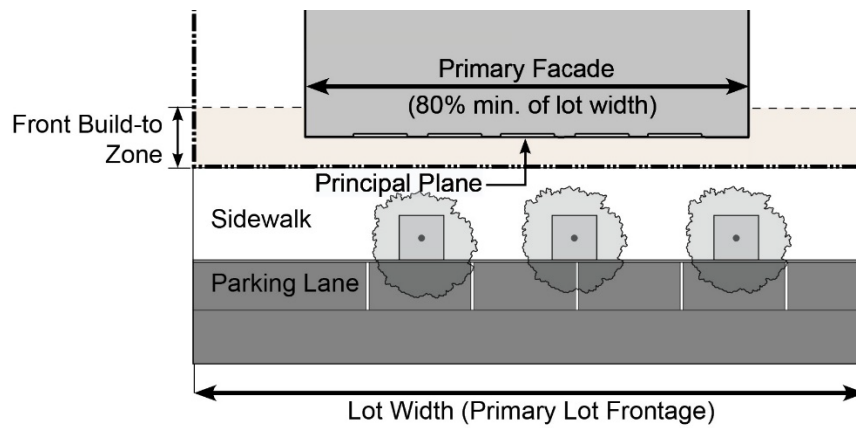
e.1.iii: Frontage Occupancy, the Primary Facade and its Principal Plane. The location of the primary facade's principal plane is not changed by facade extensions such as bay windows, awnings, porches, balconies, stoops, galleries, or by upper stories that are closer to or further from the street. (Applies to all of the D-MU, including the Downtown Historic Overlay.)
